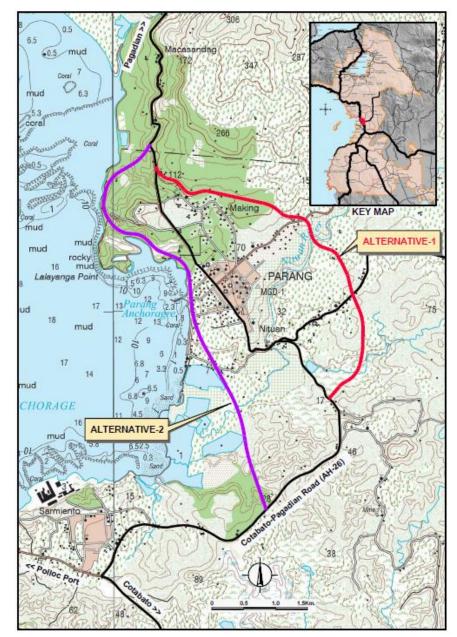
Plan of Alternatives in Sub-Project 8
